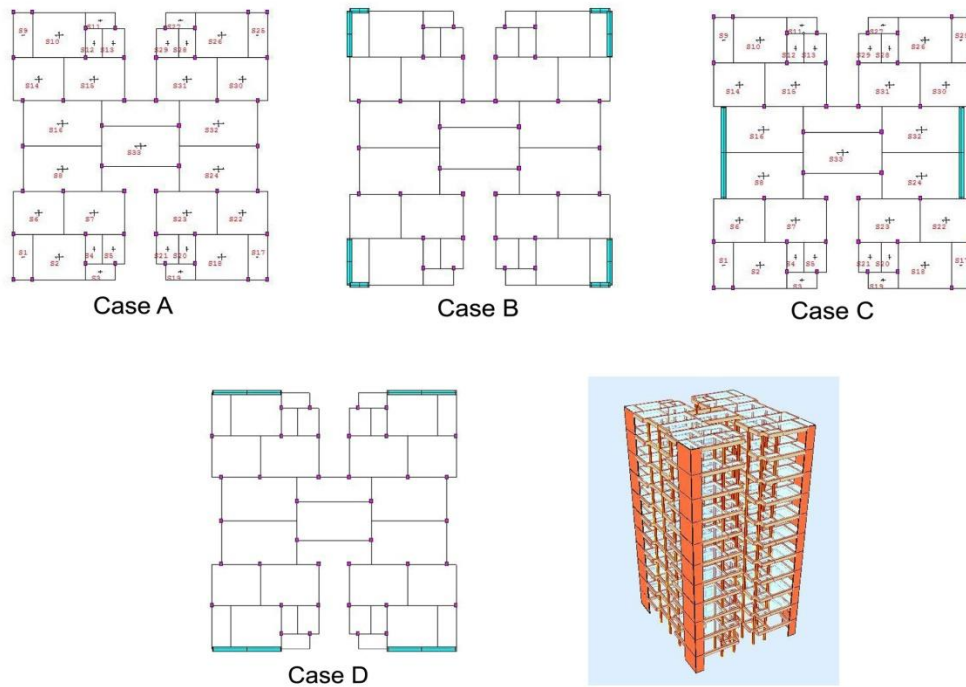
Case (A) Without Shear wall (B) Shear wall at corner (C) Shear wall in minor axis (D) Shear wall in major axis
